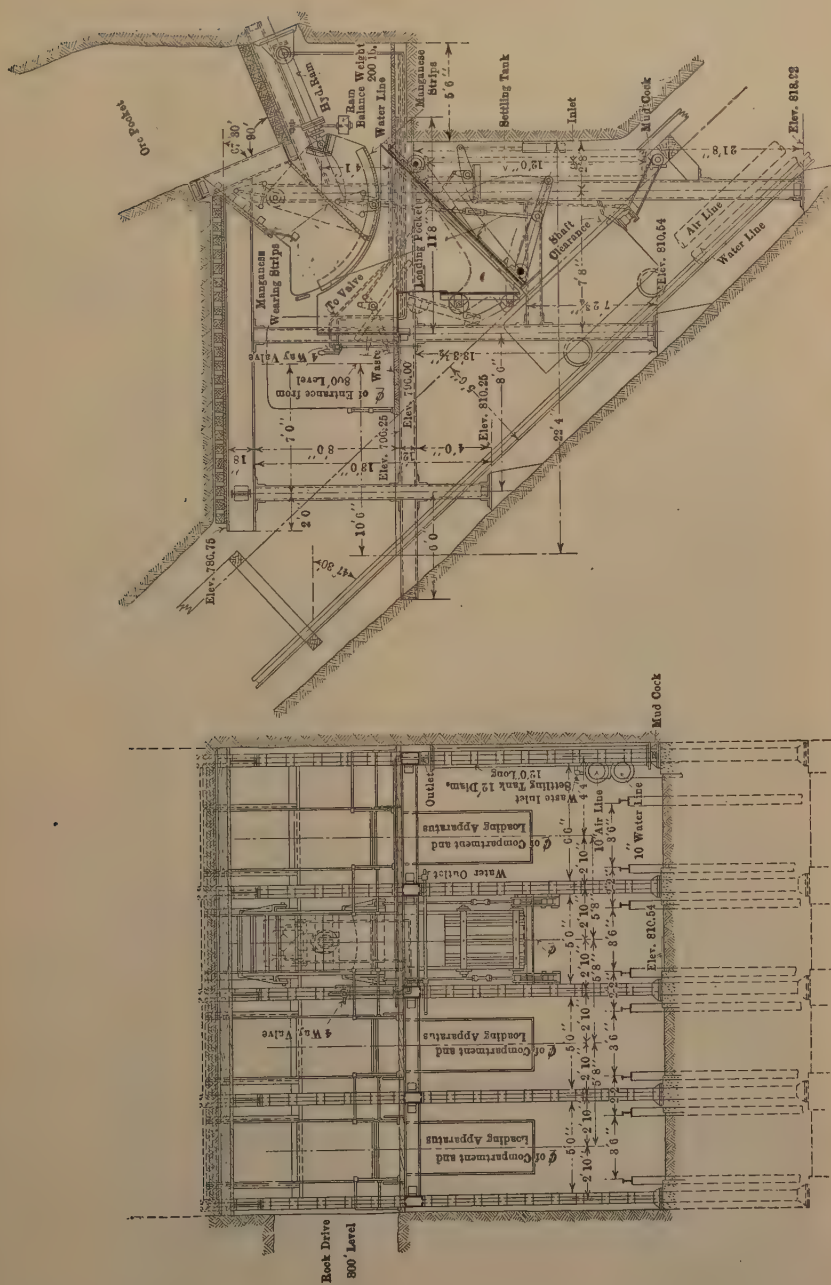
PALMER SHAFT, 800 STATION, AND LOADING POCKET.
